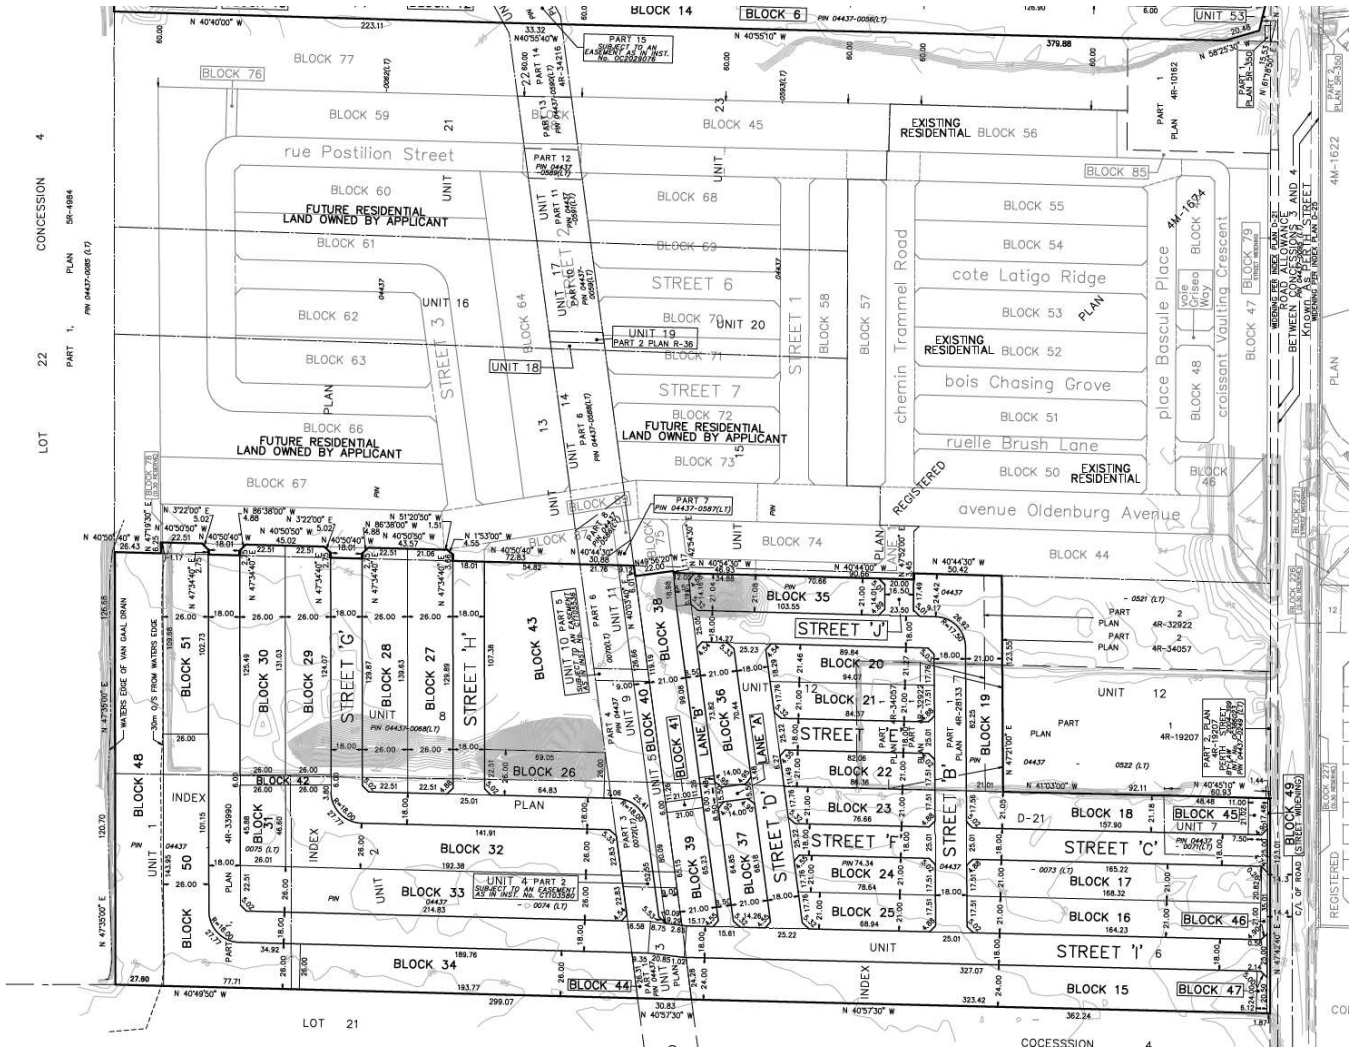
Excerpt of the Draft Plan of Subdivision (D07-16-20-0016)
